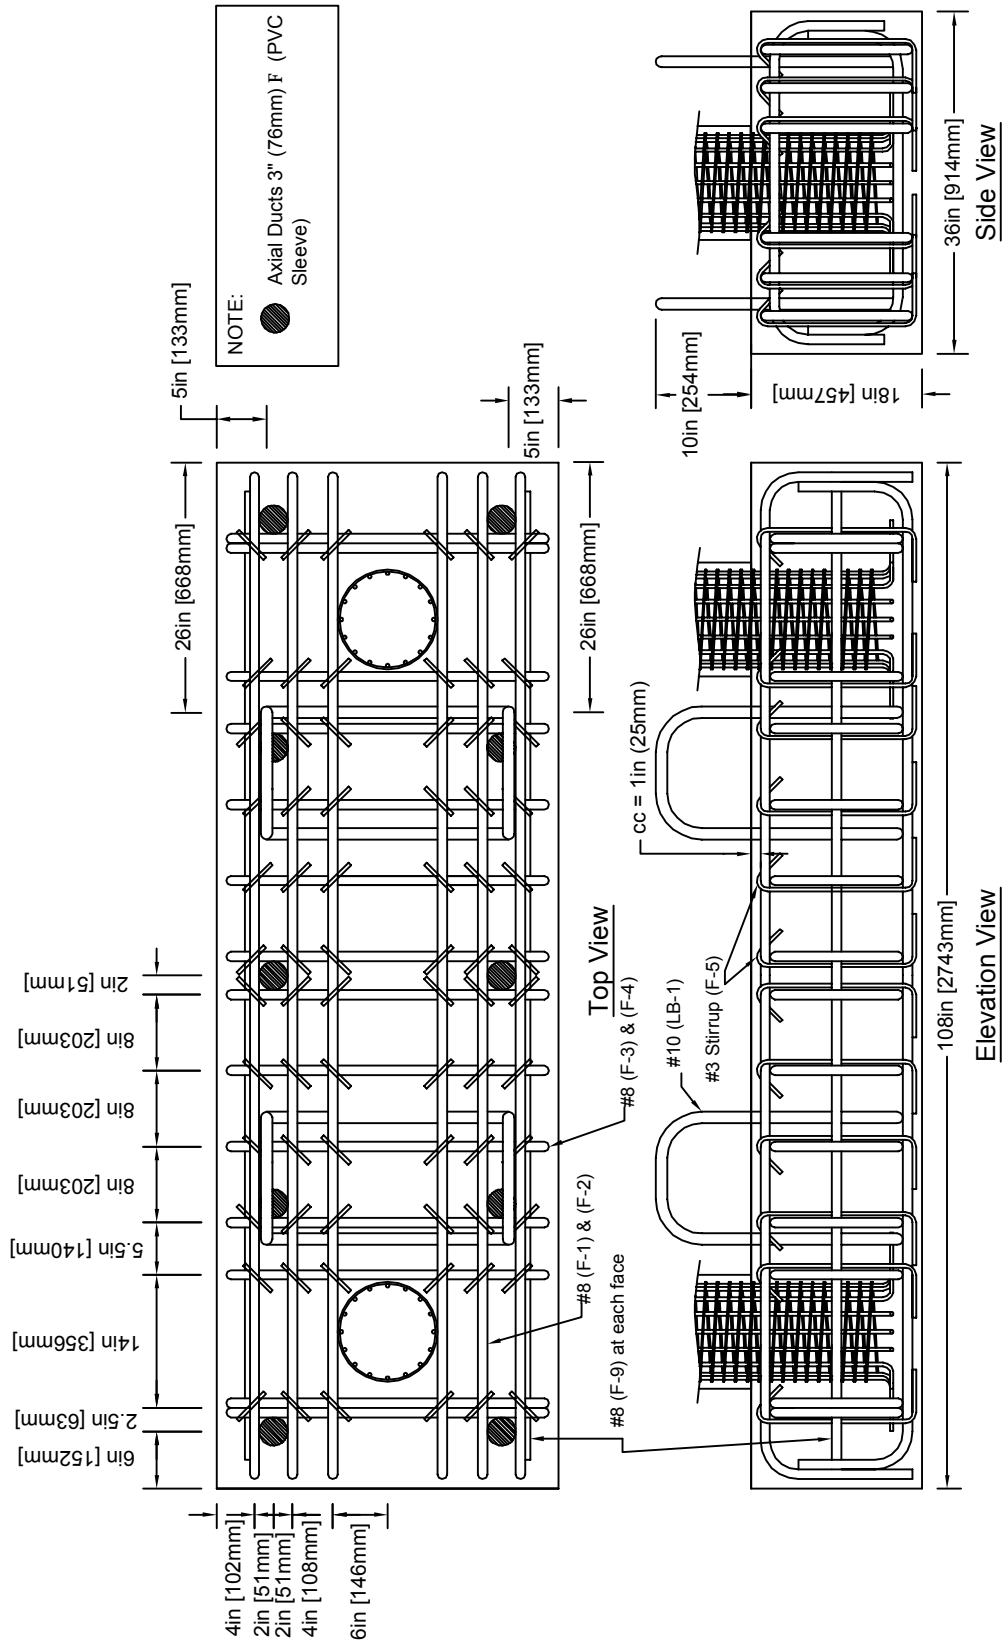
Bridge Plans Sheet 10; Bent 1&2 Footings.
